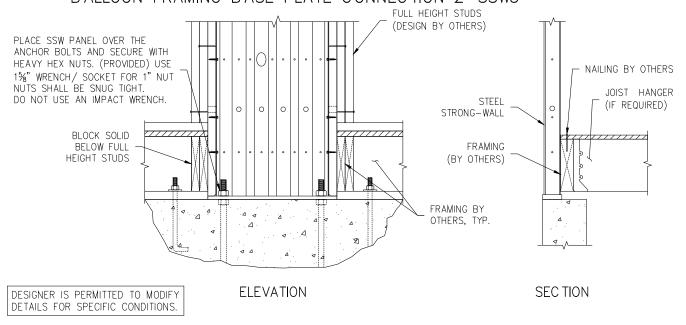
STEEL STRONG-WALL BALLOON FRAMING DETAILS (1/SSW3)
